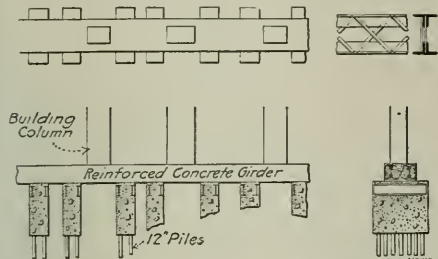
SKETCH ILLUSTRATING UNDERPINNING WITH REINFORCED-CONCRETE GIRDER
